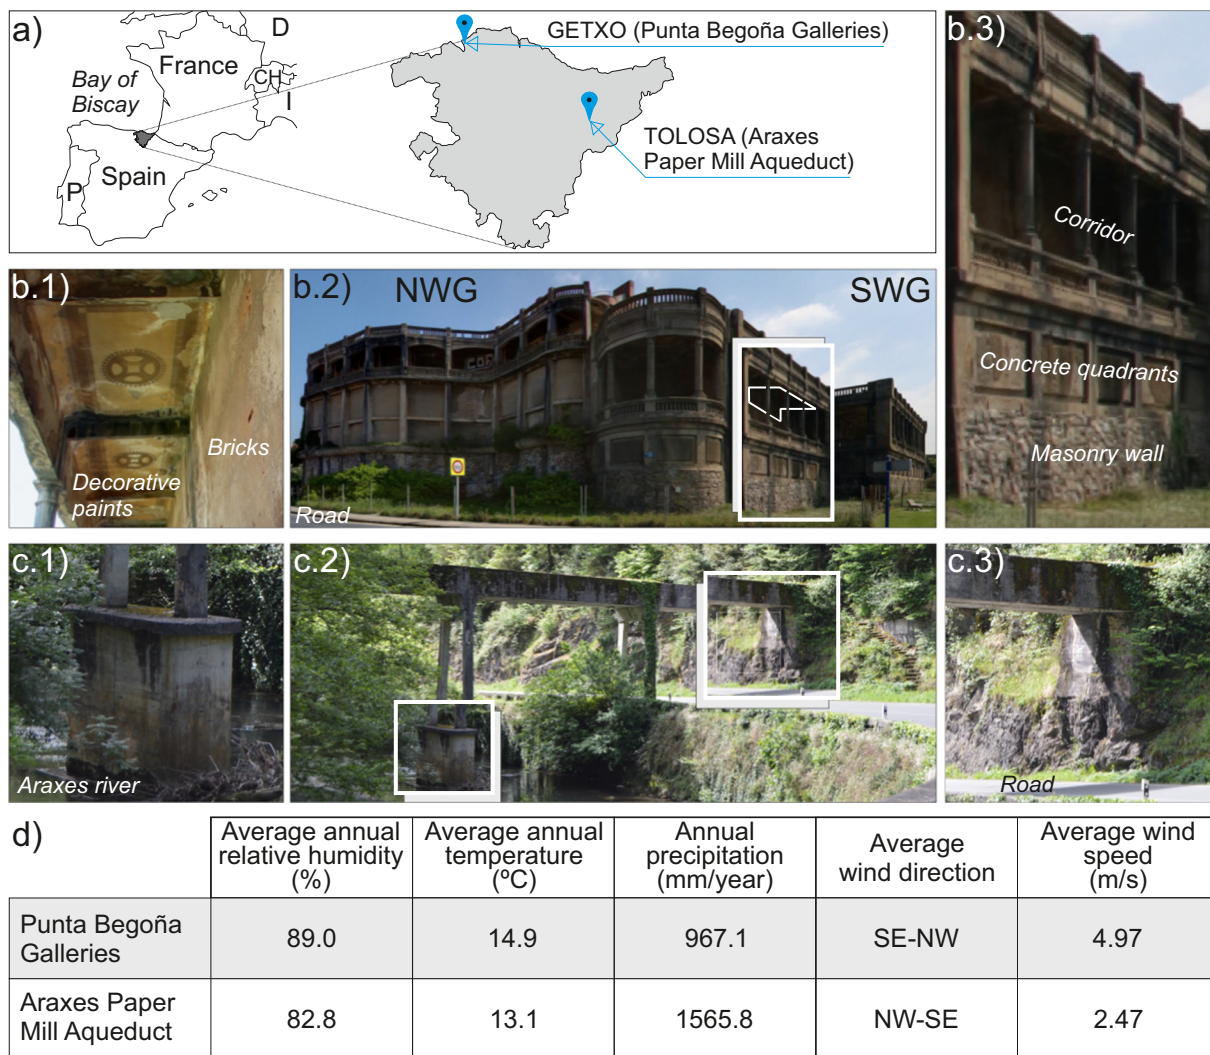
a) Geographical location of the constructions studied; b1) Ornamented ceilings in SWG of the Punta Begoña Galleries; b2) Exterior façade of the Punta Begoña Galleries (NWG: Northwest Gallery; SWG: Southwest Gallery; b3) Detail of the construction materials in the elevation of the SWG of the Punta Begoña Galleries; c1) Detail of the support of the Araxes Paper Mill Aqueduct (APMA) over the river; c2) Panoramic view of the APMA; c3) Detail of the support of the APMA on the rock slope; d) Meteorological data for both sites (taken from *Euskalmet*, 2022).
